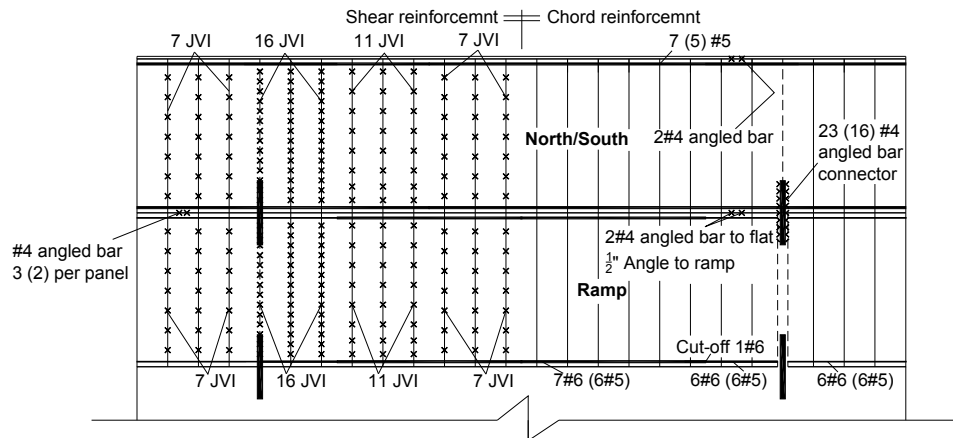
Diaphragm reinforcement design for design example 2A.
